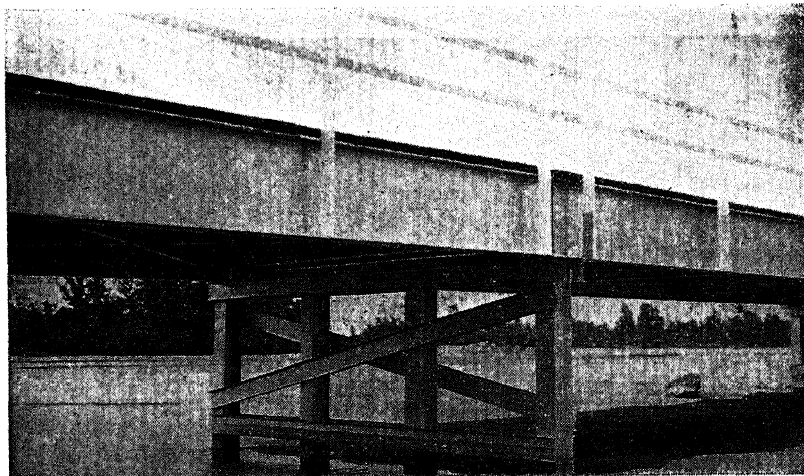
Closeup of all-field-welded bridge showing open steel piers, caps, bracing and hand rails. Typical of many secondary road all-welded bridges totaling more than 1000 tons of steel built in the middle west. See also Fig. 1072.
